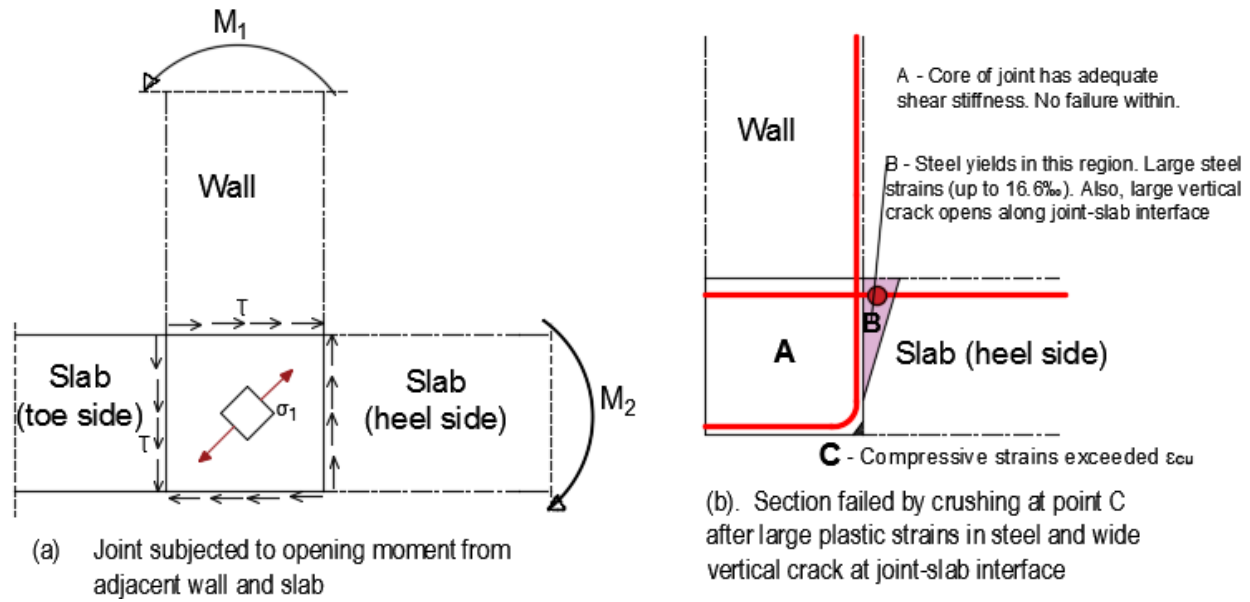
Illustration of failure mode of Reinforcement Layout 2
